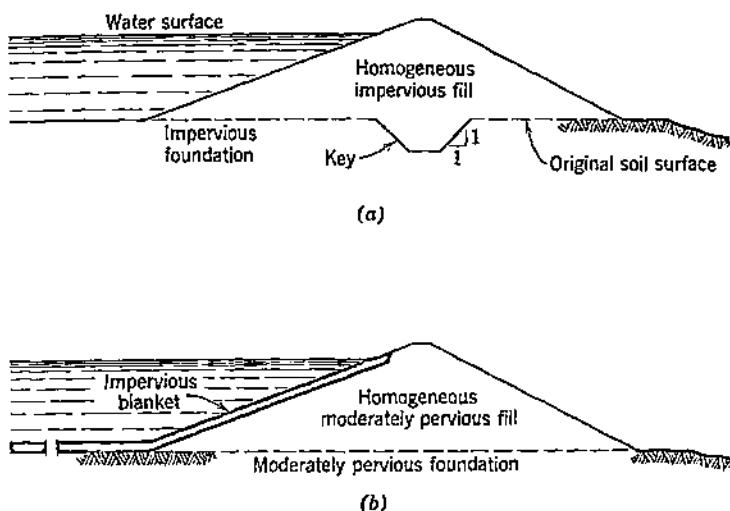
(a) Simple embankment utilizing "key" construction and (b) simple embankment utilizing an impervious "blanket" seal.
